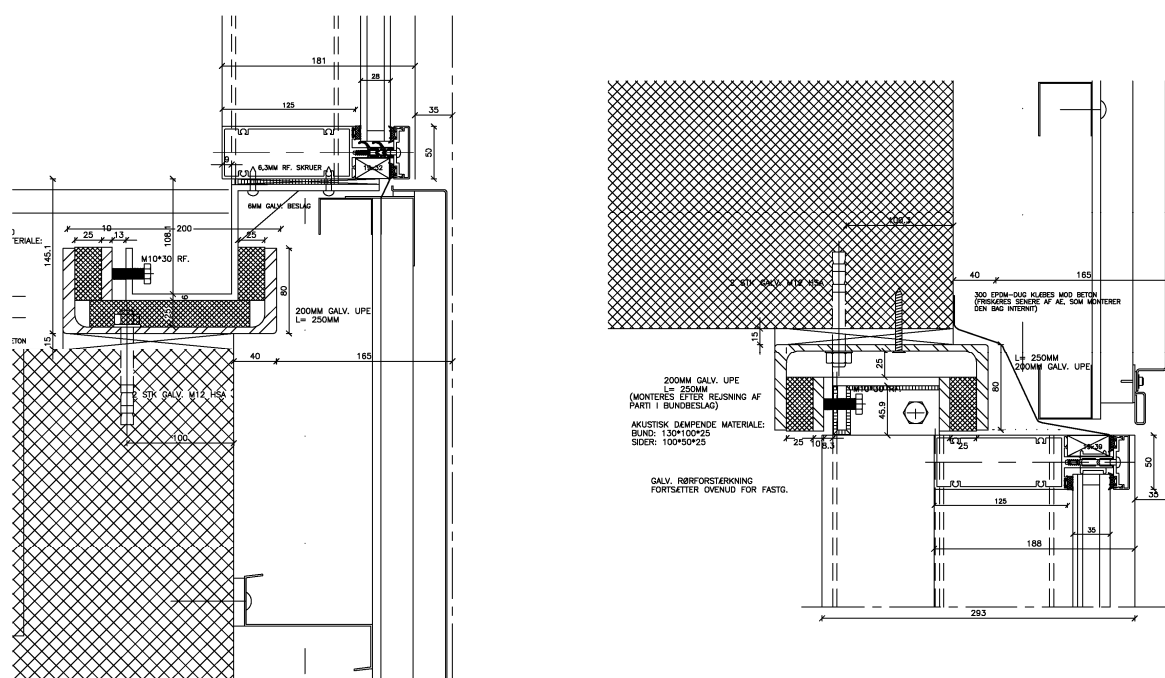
Section drawings of façade mounting brackets used for isolation from the outer box.
